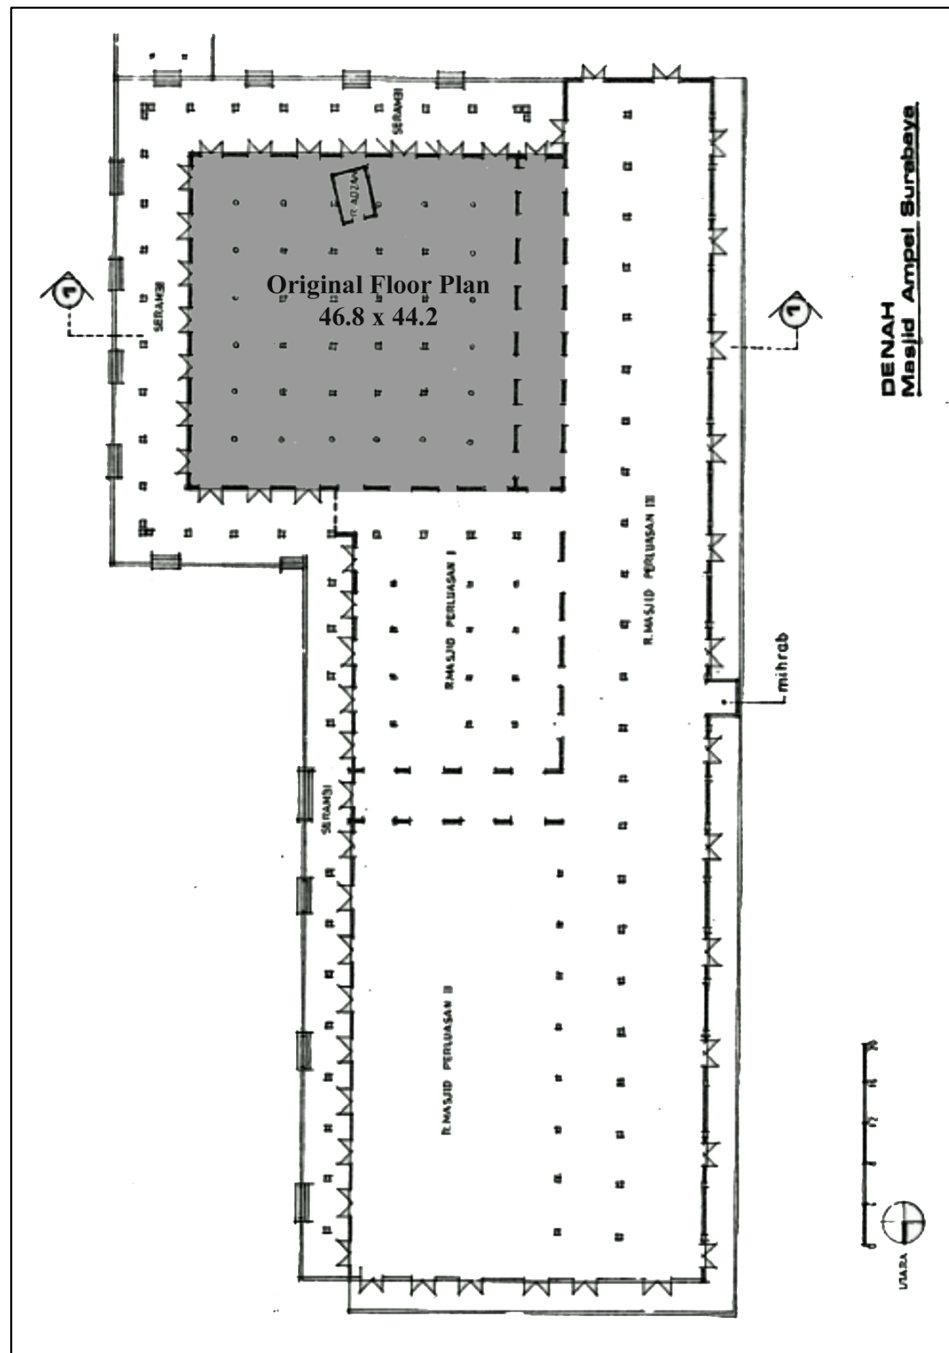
Masjid Sunan Ampel original square plan (shaded in grey)
